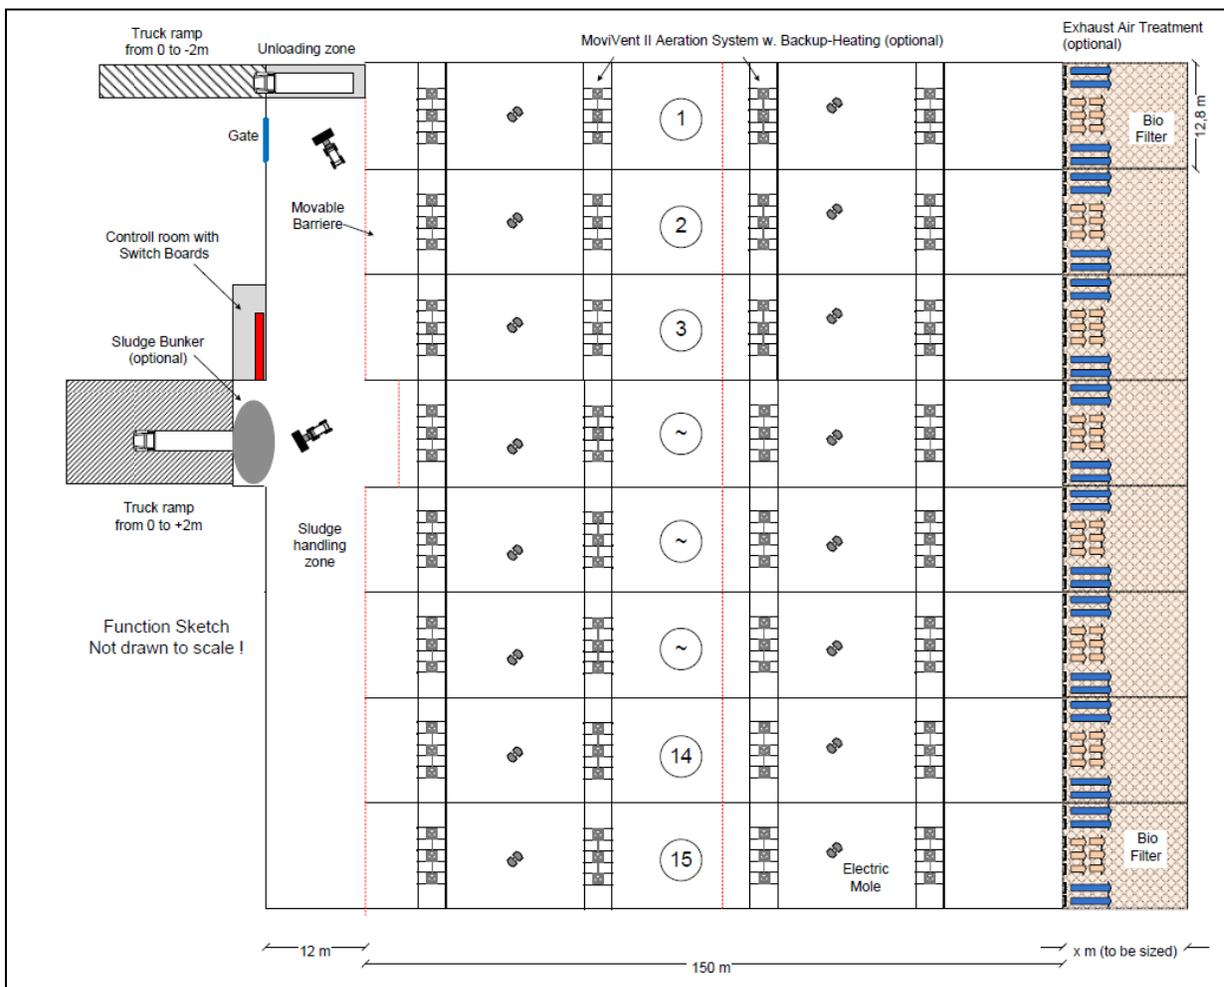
Example Solar Drying Facility Layout (image courtesy Kruger)
